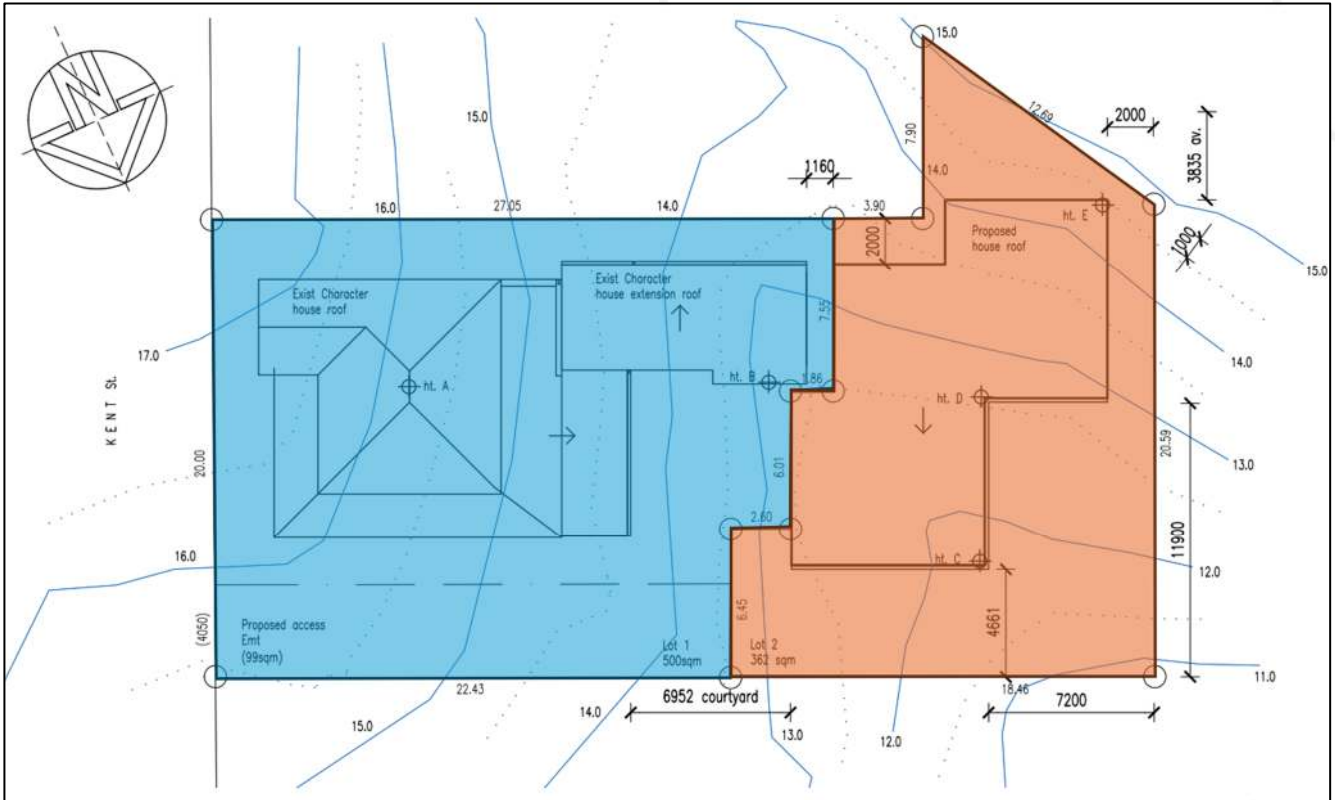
Proposed subdivision plan (Source: Source: Price Musgrave Architecture)
